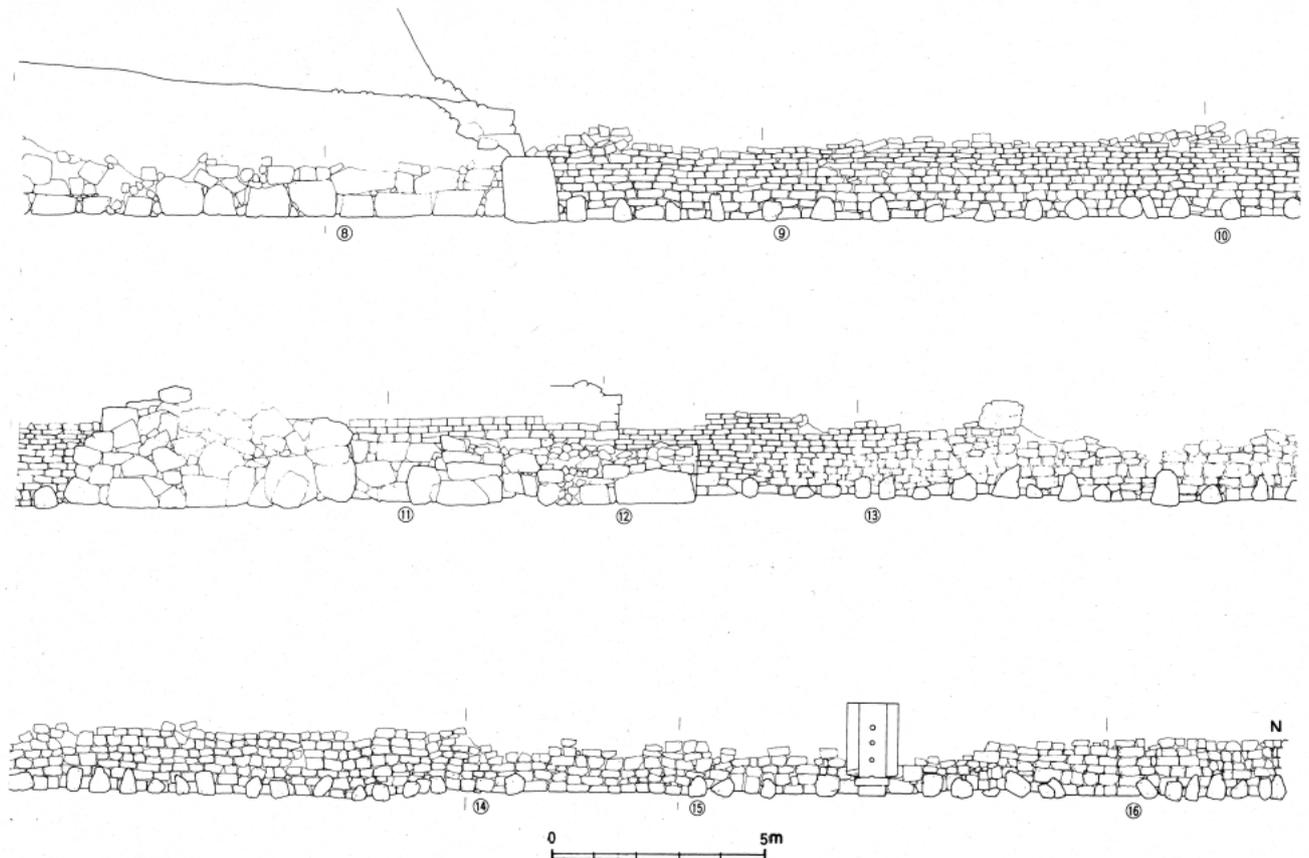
Anapitch, Shore Protection Stone Wall (elevation view)
